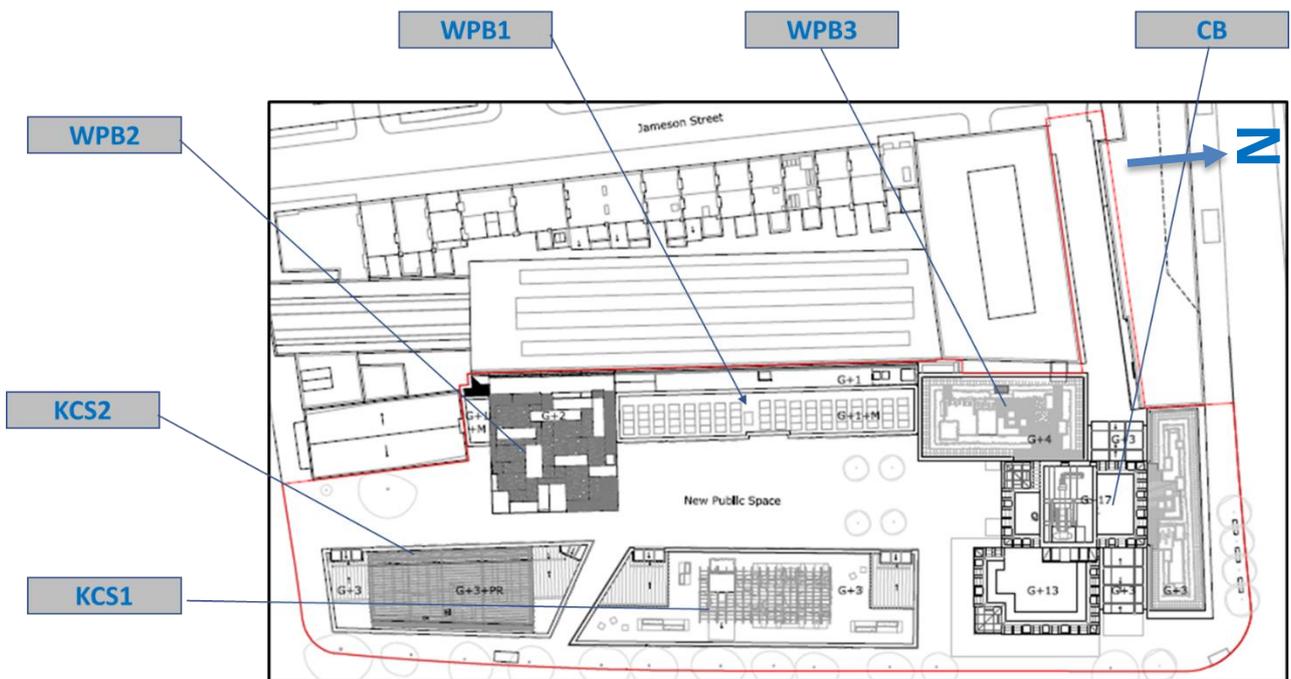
Site plan (1059 P-SITE-AA (0-)002)
